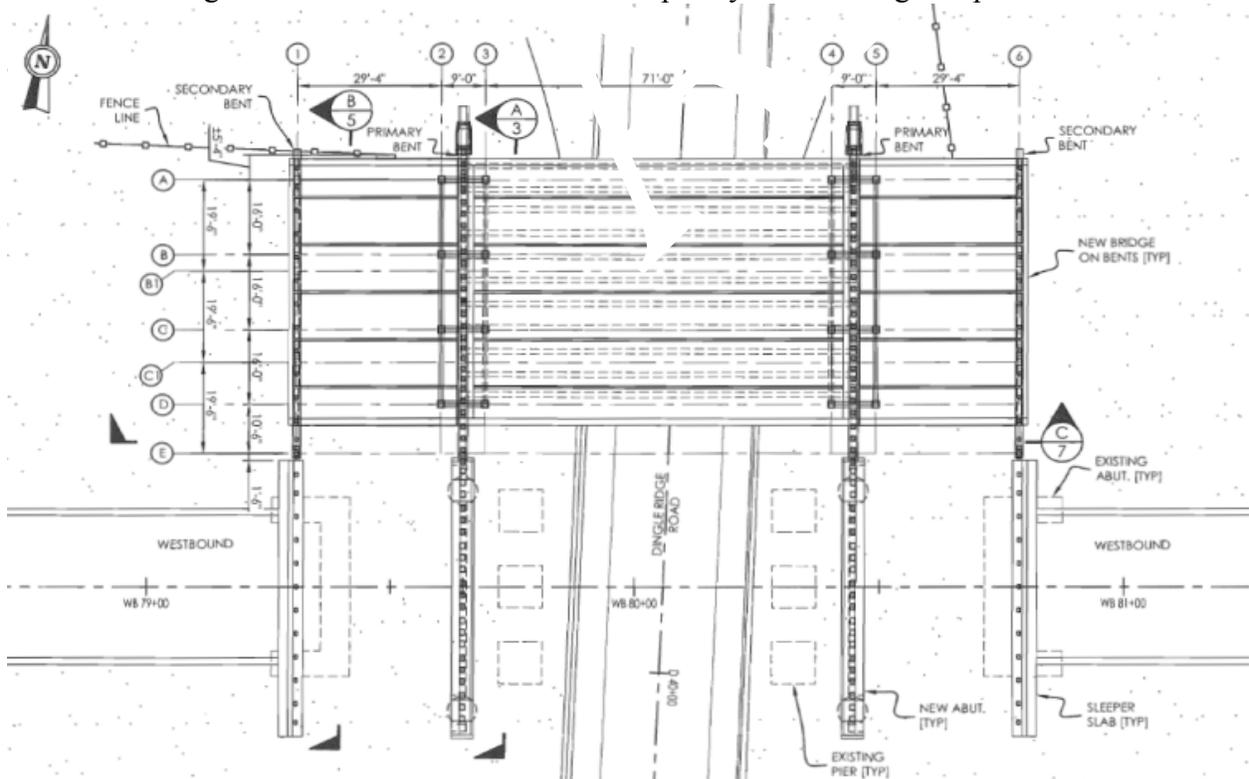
Diagram. Plan showing new bridge on bents aligned with new abutments and sleeper slabs.
